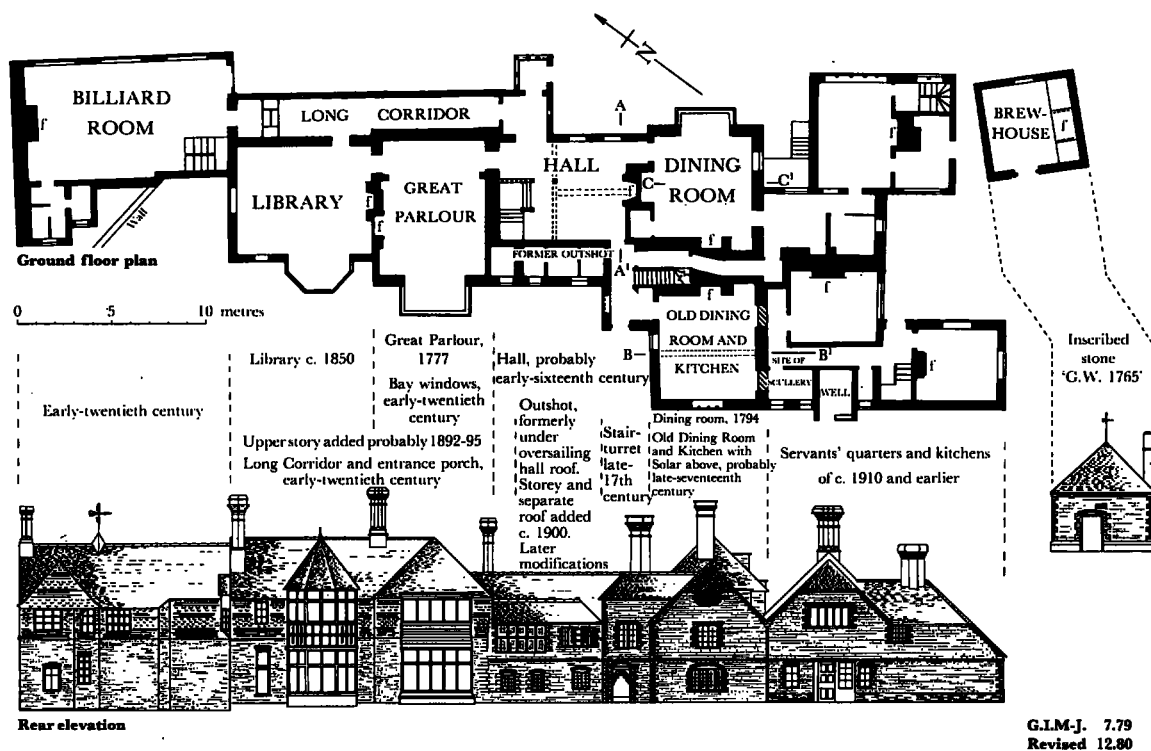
The Wakes: ground-floor plan and rear, or garden, elevation.
